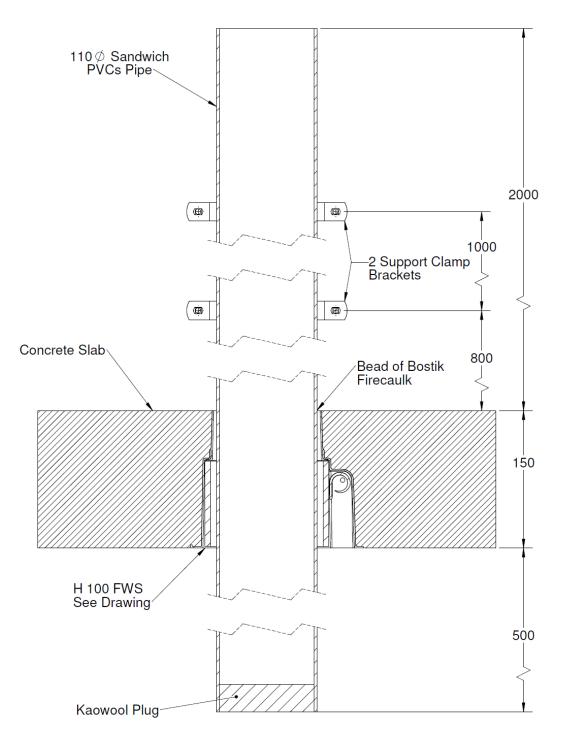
Specimen 7. 100 mm Ø PVCU Pipe Stack with H 100 FWS Cast-in Collar
